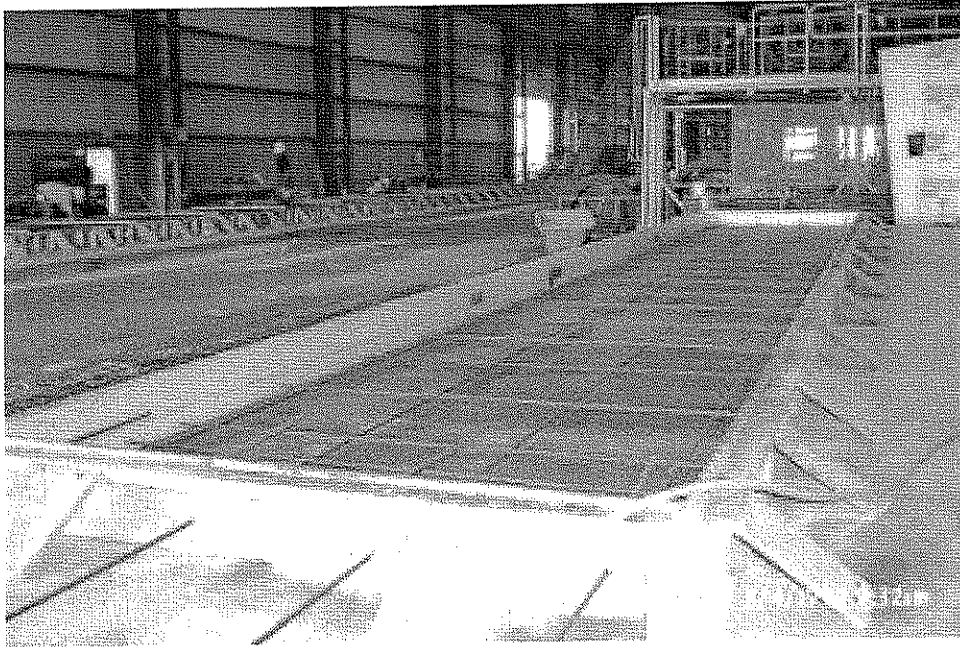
Panel formwork with face wythe prestressing strand and reinforcing steel in place.
